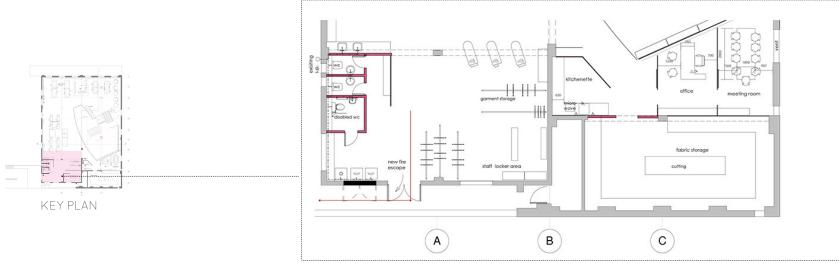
First floor water & sanitation plan-not to scale (Author 2013)
